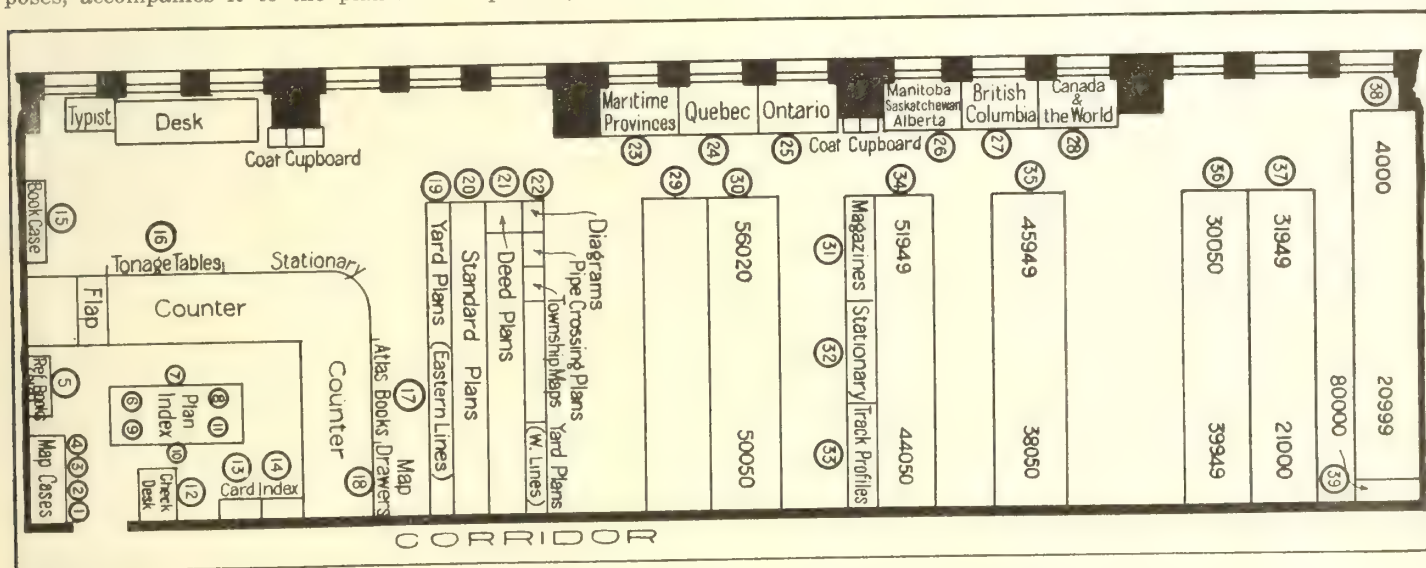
Plan room, Chief Engineer's office, C.P.R., Montreal.
